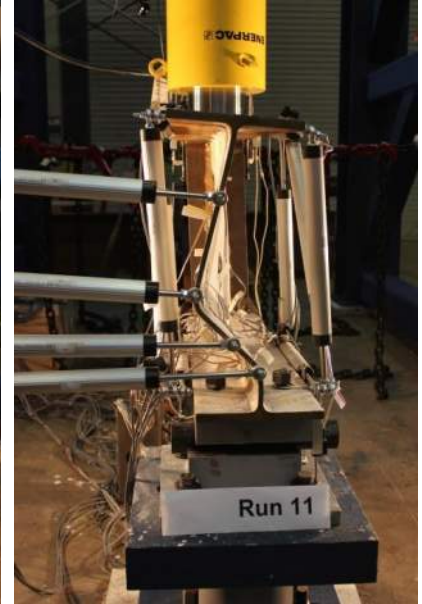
Undamaged Girder Longitudinal: +0.25 in without Load
